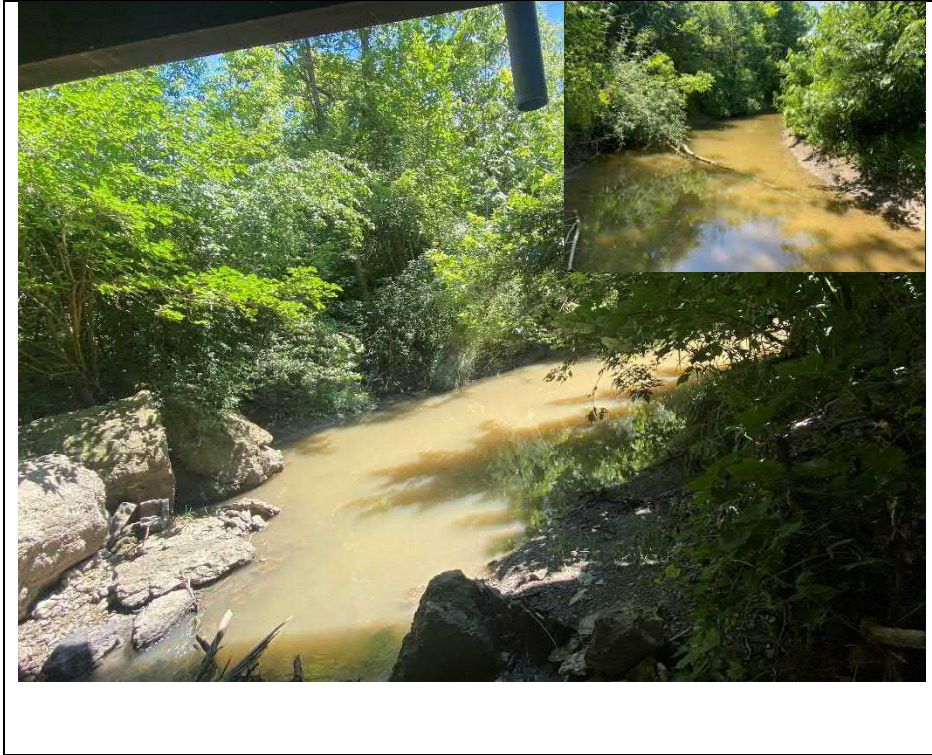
Wall drains and erosion at footing at east abutment (Looking East)
